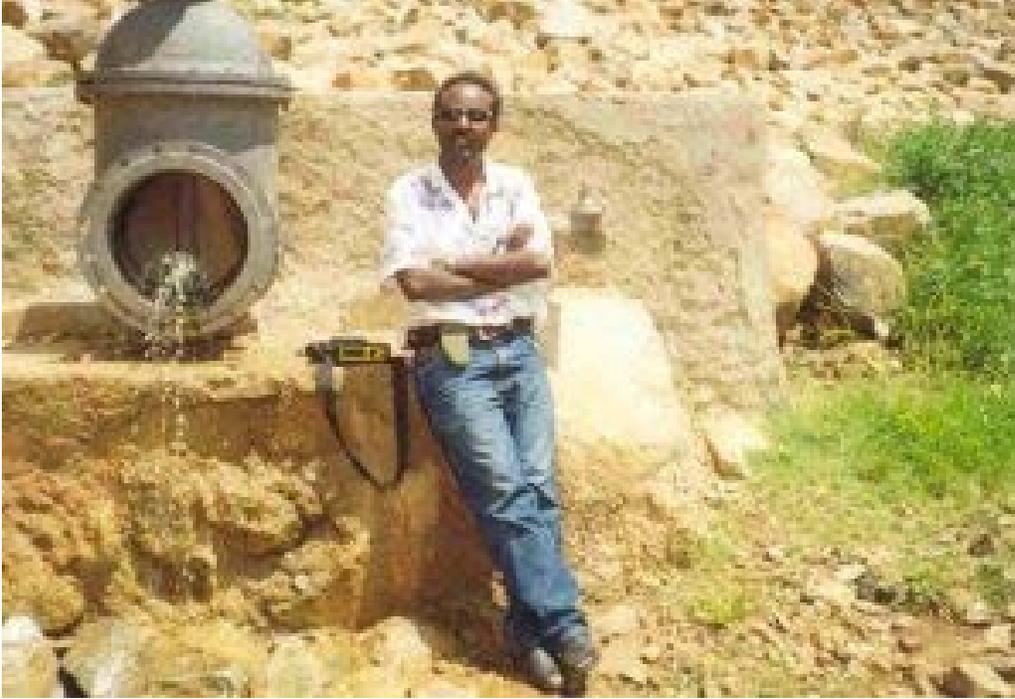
Halhal outlet structure (photo taken after the construction ended).
